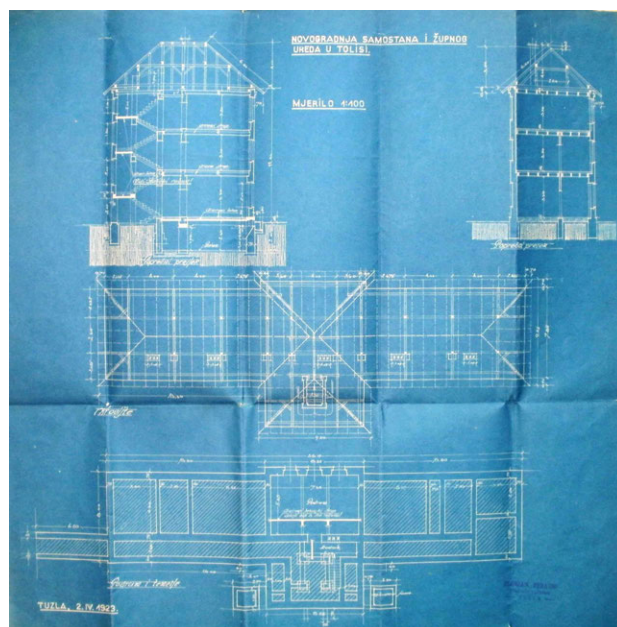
The Convent of the Assumption of Mary: floor plans of foundations and roof plan, and cross sections, segment of the project „Novogradnja samostana i župnog ureda u Tolisi“ (New construction of convent and parish office in Tolisa) done by architect Florian Strauss, dated on 2nd April 1923 (Archive Tolisa)
